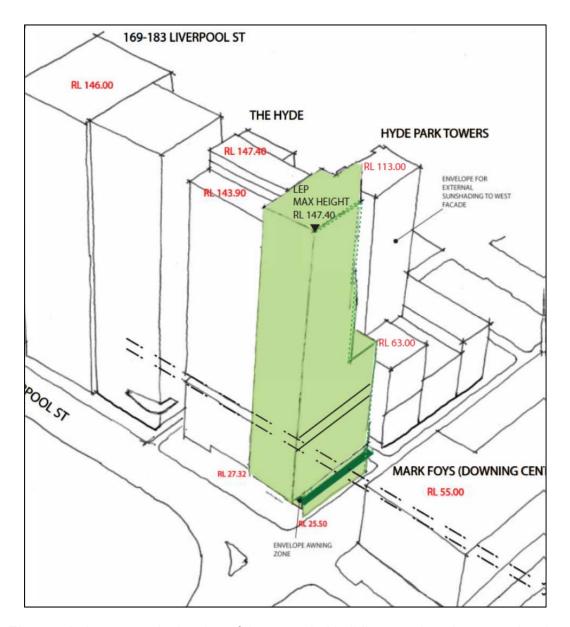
An axometric drawing of the amended building envelope incorporating the additional height (to 120.5 metres) and the chamferred southwestern corner
